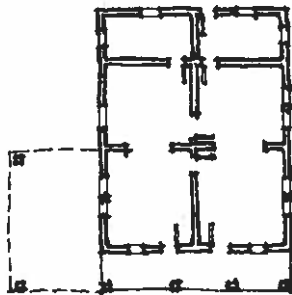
The Craftsman Bungalow. Floor plan from the Tenth Street Historic District.
